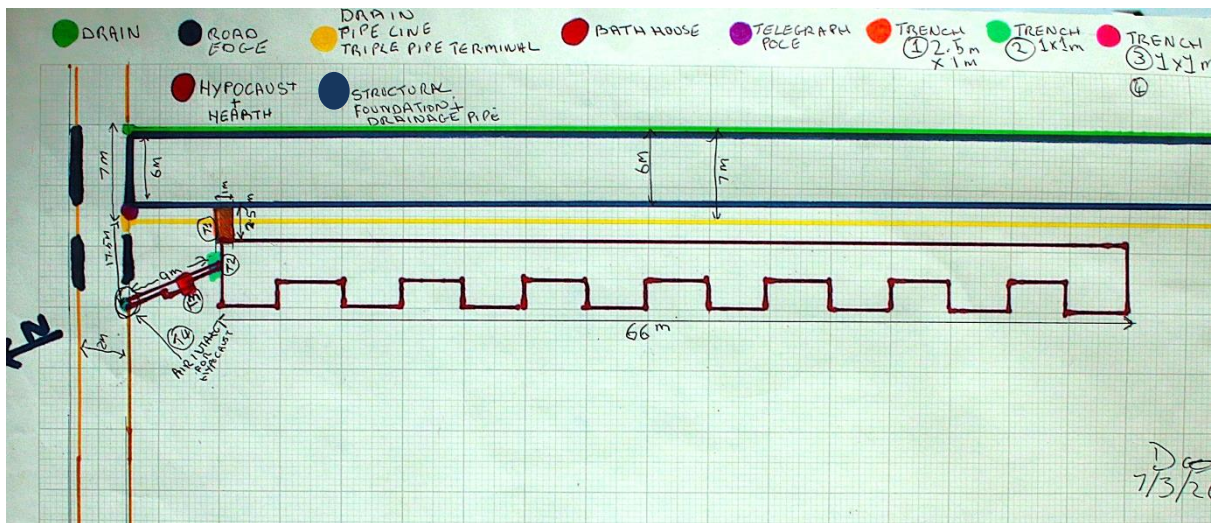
Simplified Site Plan (not to scale) showing trench locations, Roman road alignment, waterway, drainage infrastructure and bathhouse heating system.
